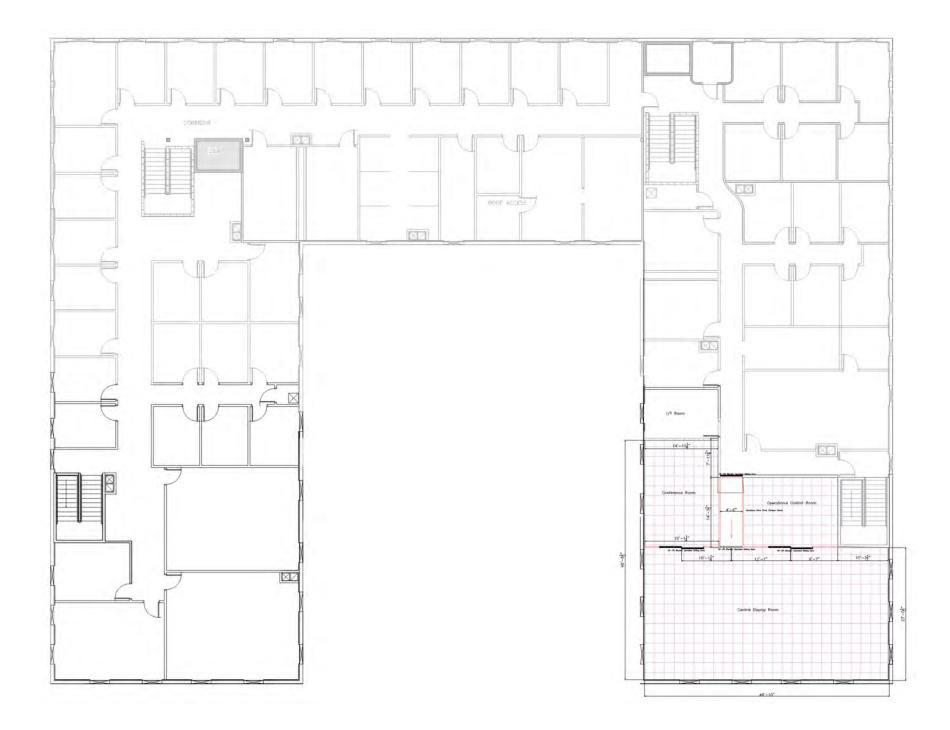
EXISTING BUILDING PLANS AND CONCEPTUAL FLOOR PLANS
